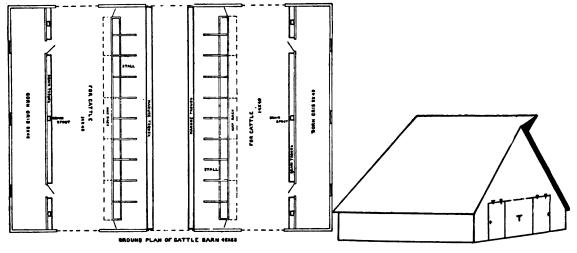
AN IOWA CATTLE BARN (FLOOR PLAN AND ELEVATION.)
